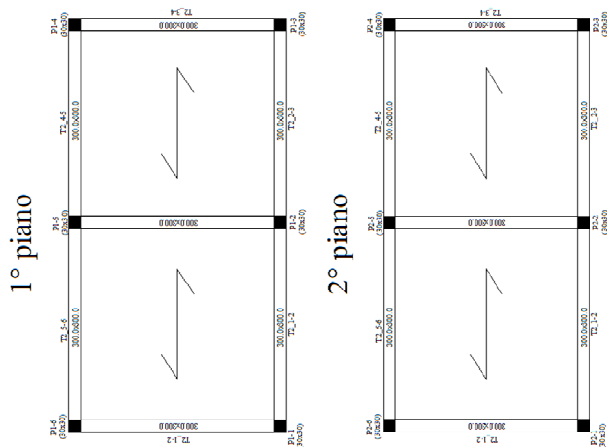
Plans of first and second floors with beams and columns identification label. / Piante del primo e del secondo piano con l'identificazione di travi e pilastri.
